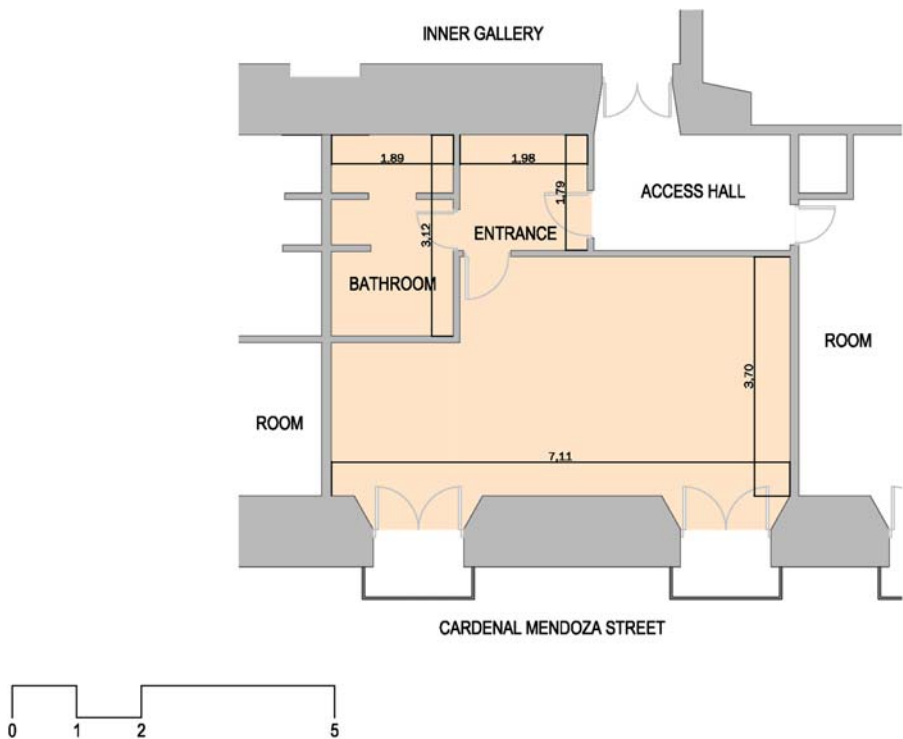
Room of the guesthouse under study. Testing area floor plan (dimensions in meters).
